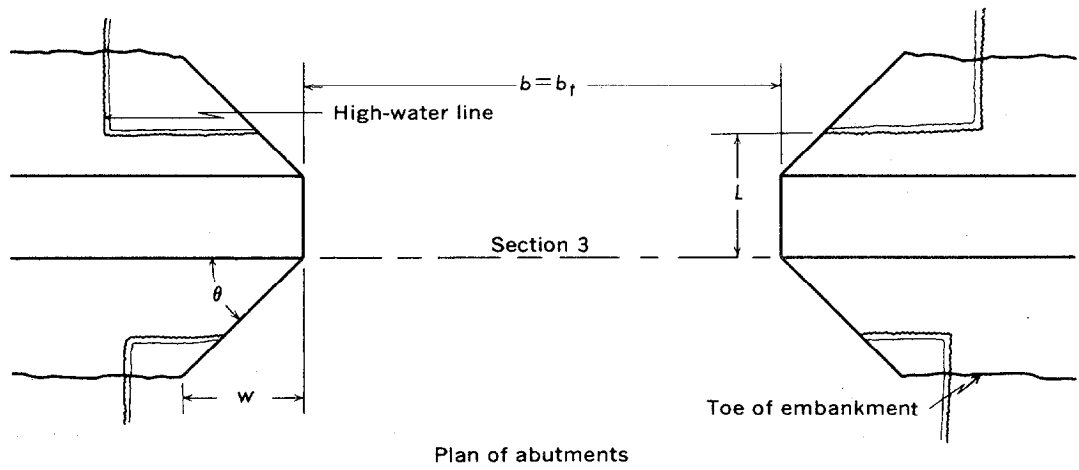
Definition sketch of type 4 opening, sloping embankments and vertical abutments with wingwalls (after Matthai).
